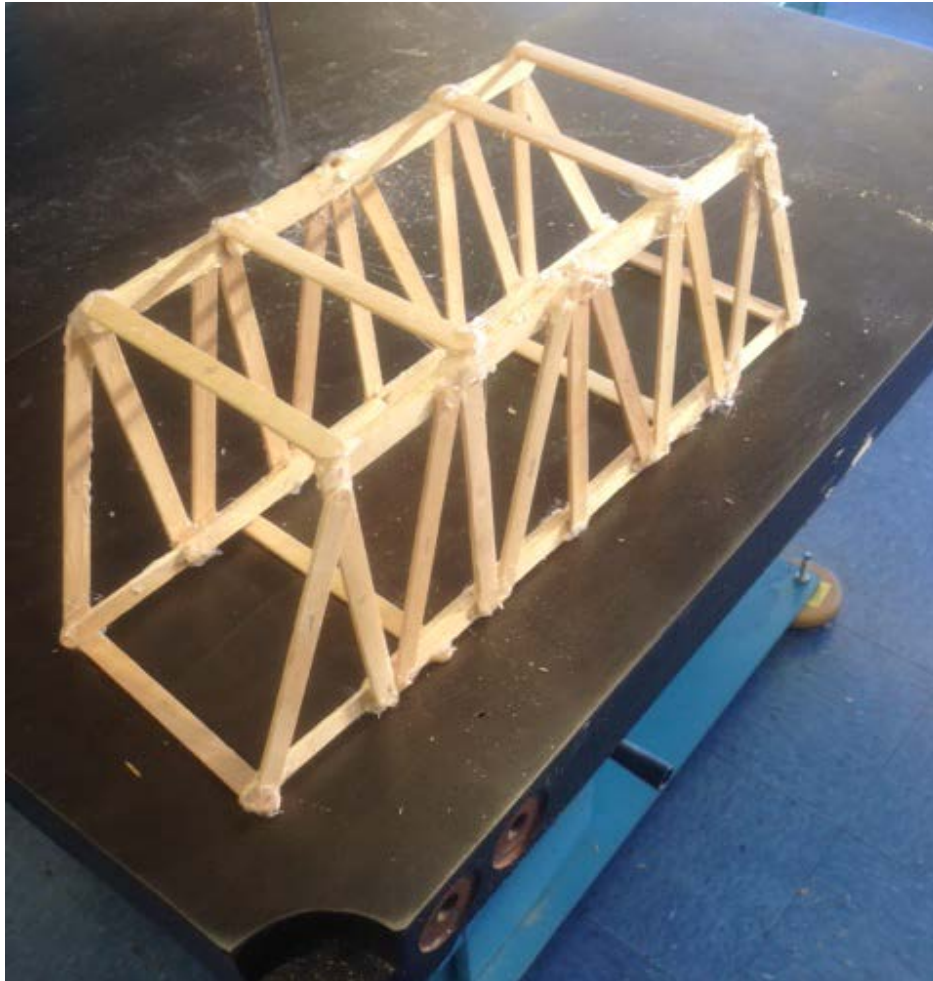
Howe Truss Bridge Prototype Failure before Load Testing
